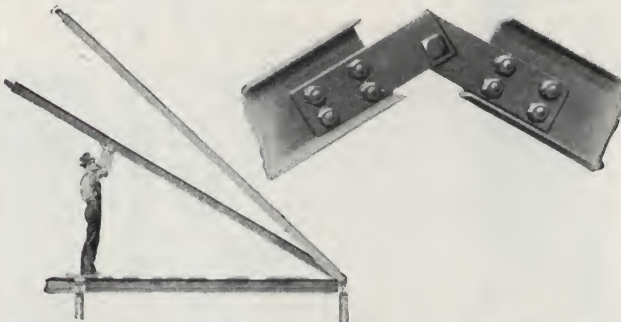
, Fig. 33. Rafters Raised from the Eave Hinge and Each Pair Joined with a Pin-connected Ridge Construction
